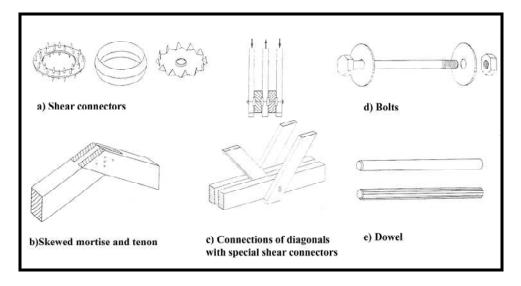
Typical timber connections used for jointing timber pieces (Götz et al., 1989:47).
